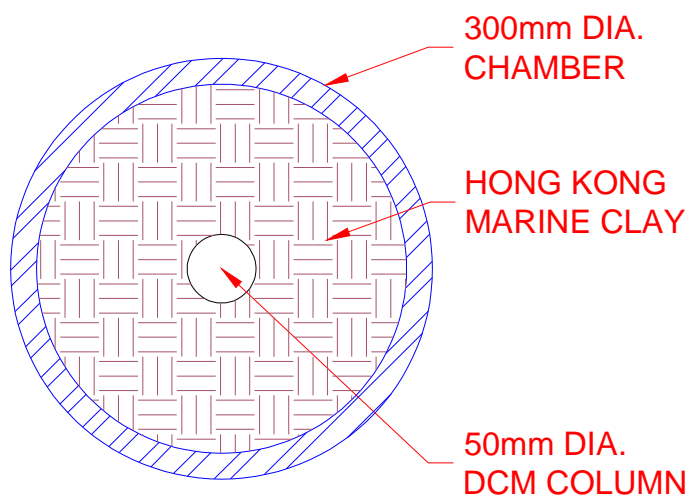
Treated ground model consisting of preconsolidated untreated soft clay and a cement mixed soil column at the center in a cylinder mold (Fang and Yin, 2007)
